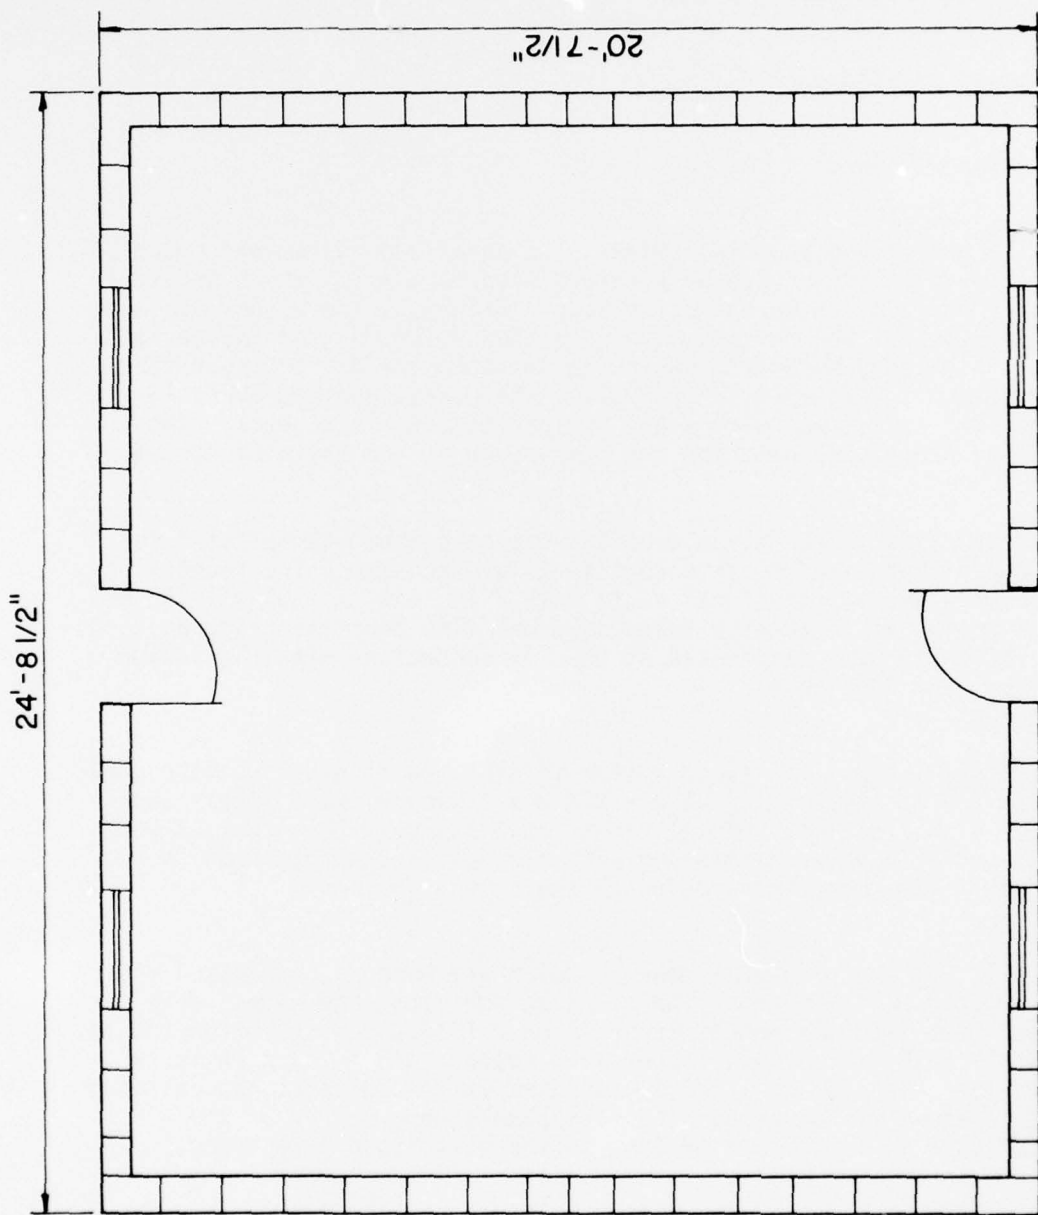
Floor plan -- paperboard building. SI conversion factor: 1 ft = 0.3048; 1 in. = 25.4 mm.
